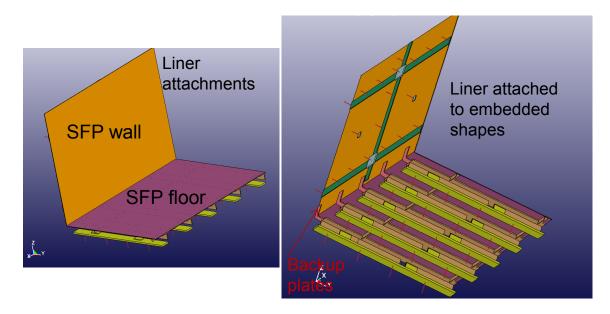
Outline of detailed finite element model of the SFP liner representing attachments to the SFP floor and walls (E and W walls)
